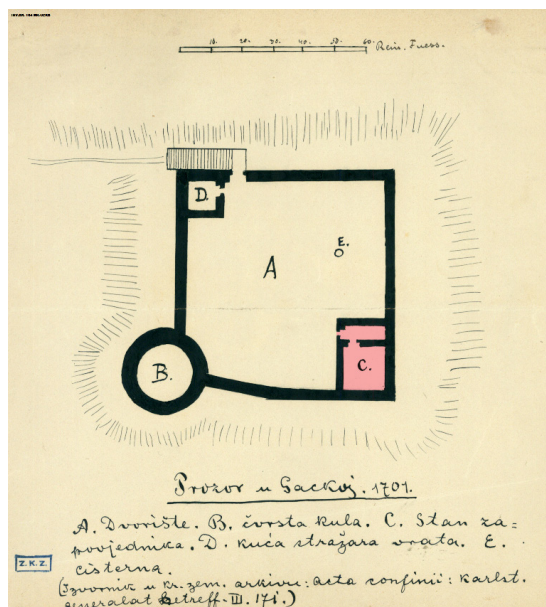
Prozor, ground-floor plan of the fort, drawing: Gj. Szabo after G. Pieroni, before 1920; MK-UZBK inv. no. 164; print: R. Mavar, 2016.
